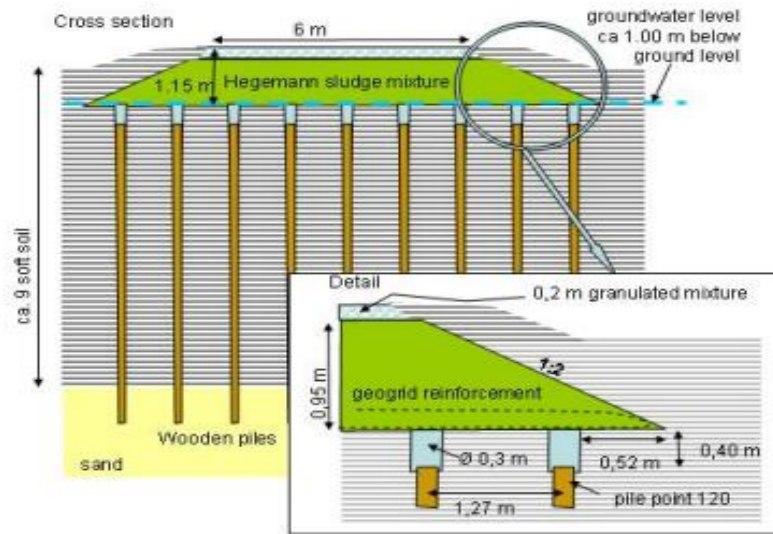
Scheme of the full-scale test Kyoto road (after Eekelen et al., 2009)
